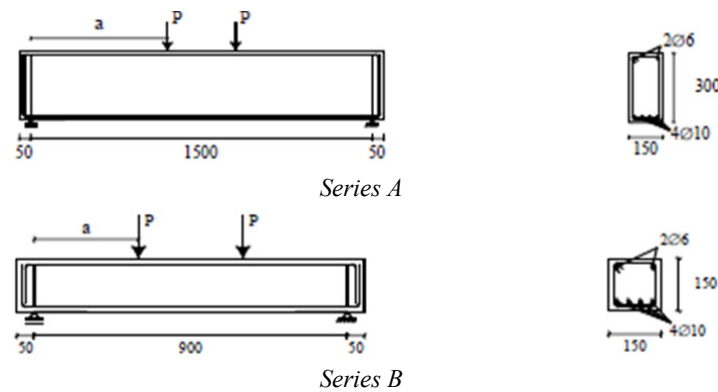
Details of the control beams (dimensions in mm) (Barros and Dias 2003)
